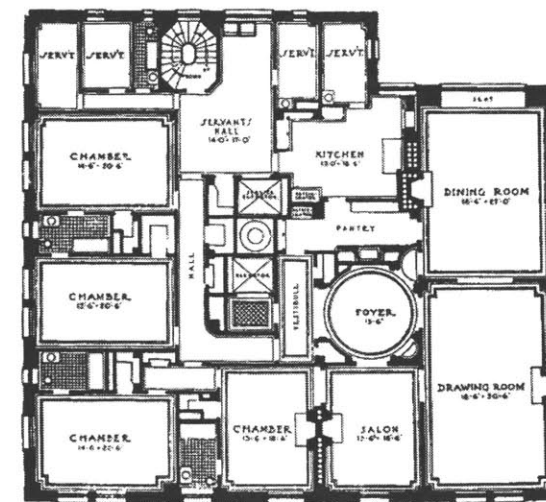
Luxury apartment plan, 635 Park Ave., 1912.
